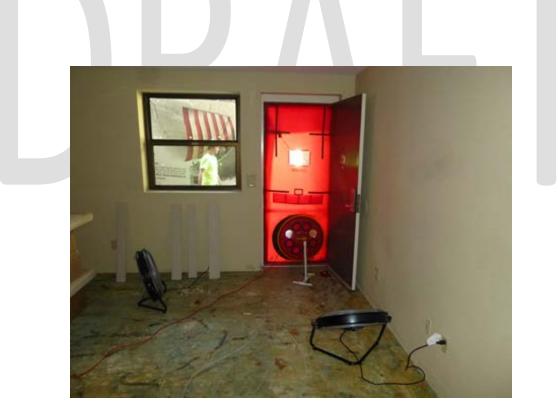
Blower door installation in a suite and the use of floor fans to facilitate air mixing.
